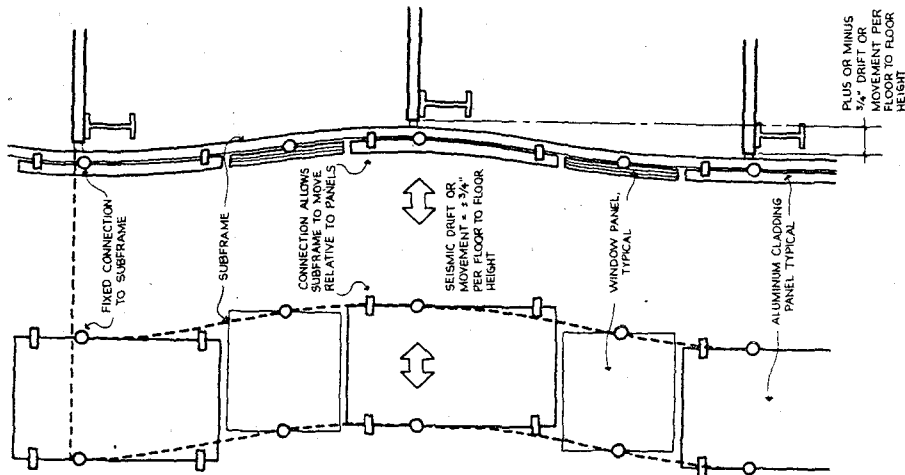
SCHEMATIC DETAILS SHOWING SEISMIC MOVEMENT OF METAL AND GLASS PANEL SYSTEM AS DESIGNED BY ARCHITECT AND ENCLOSURE WALL CONSULTANT.
